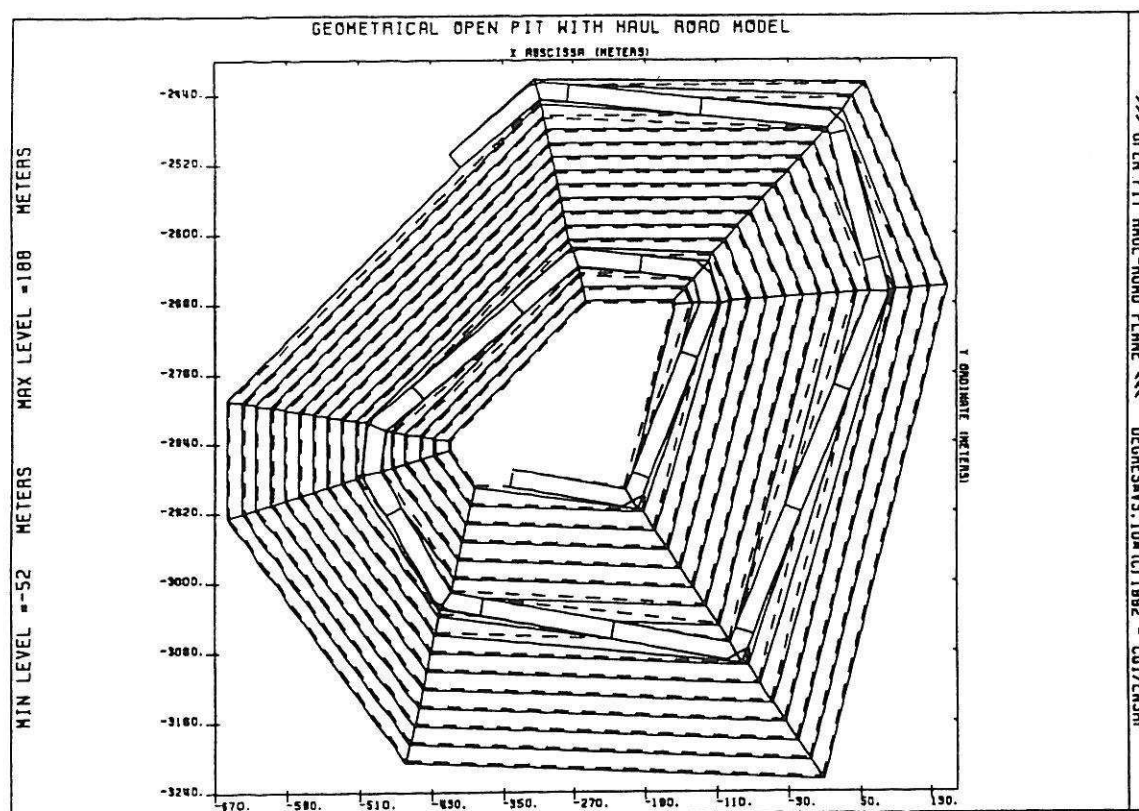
Plan of an open pit geometry with haul road (DEGRES program)
